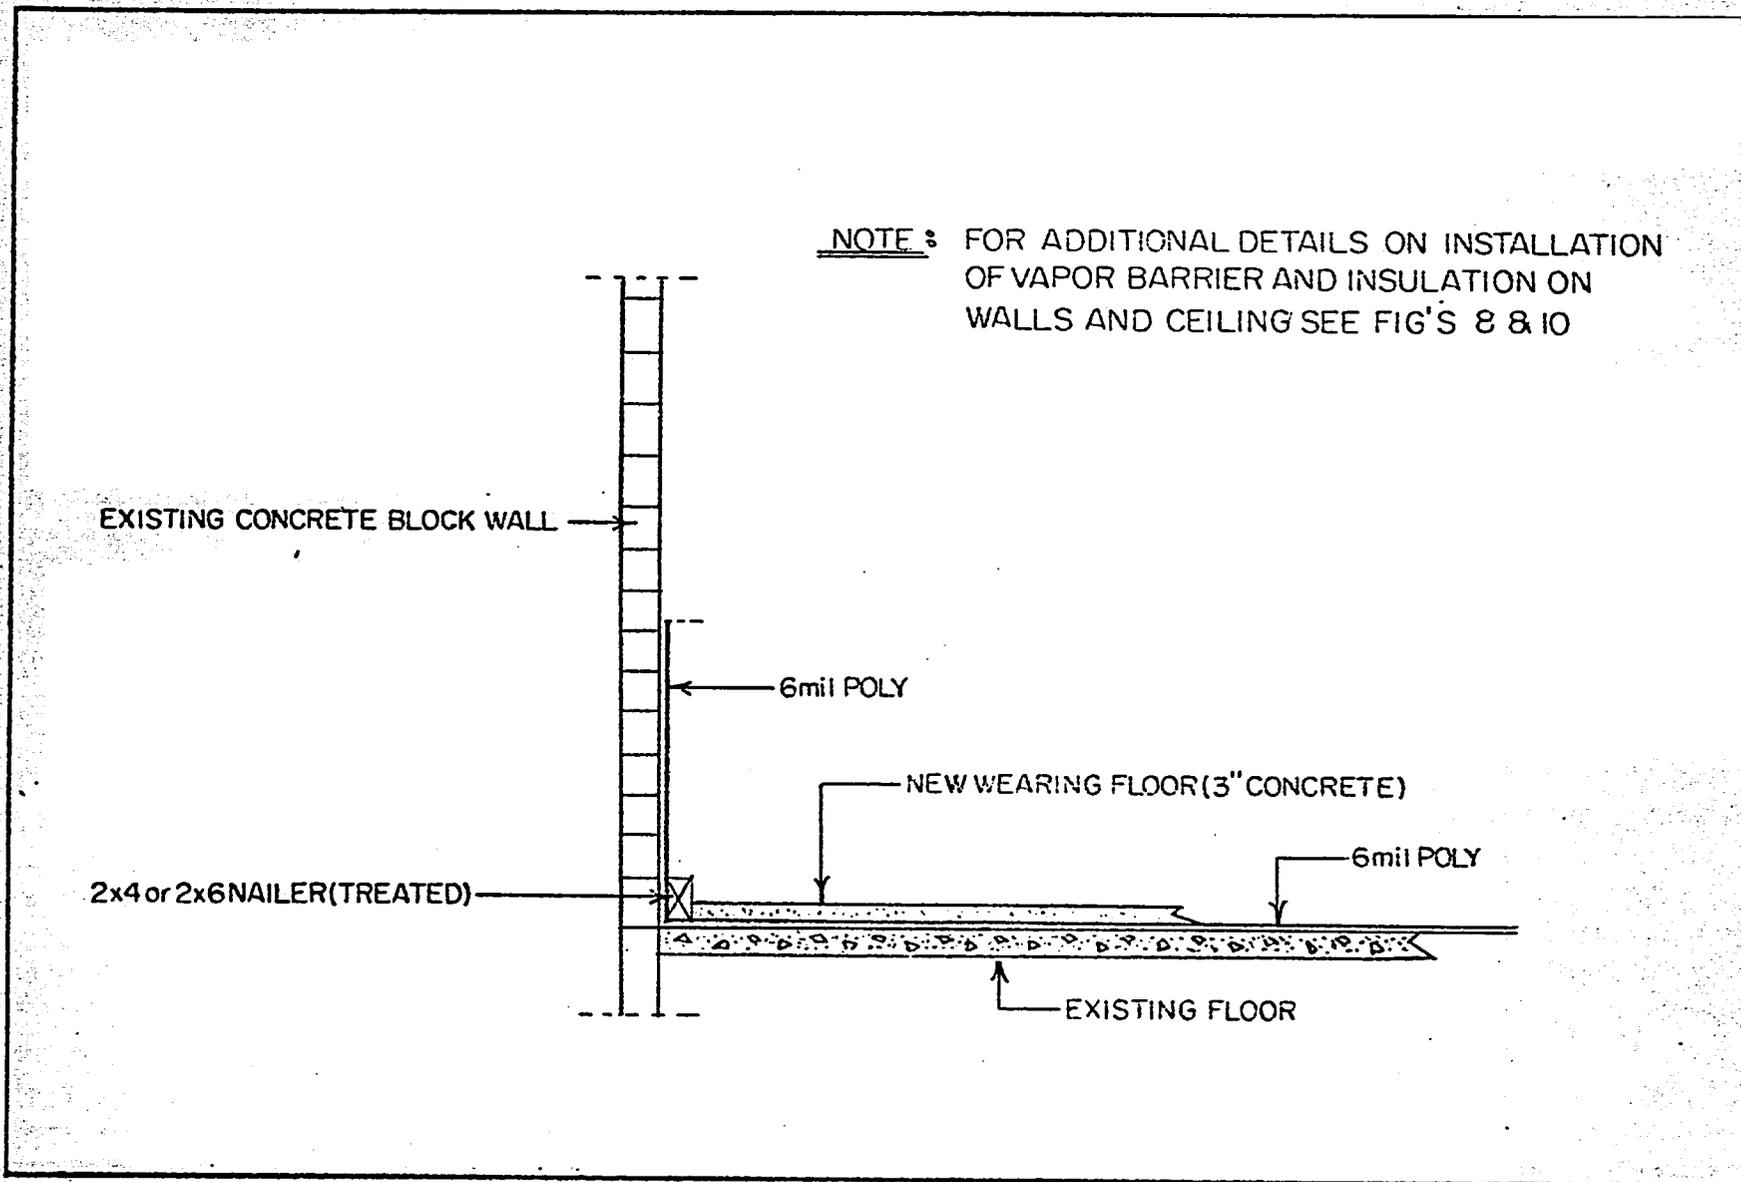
Details of floor installation in storage room to be remodeled in Divisa.
